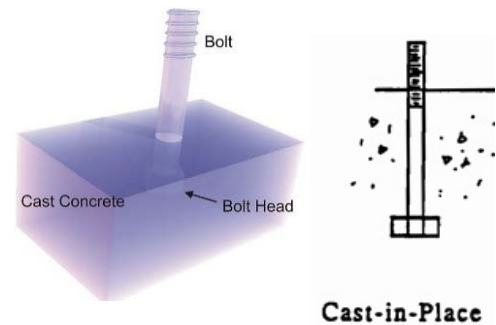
The bolt is used in precast concrete in order to transfer the load to the base material.
